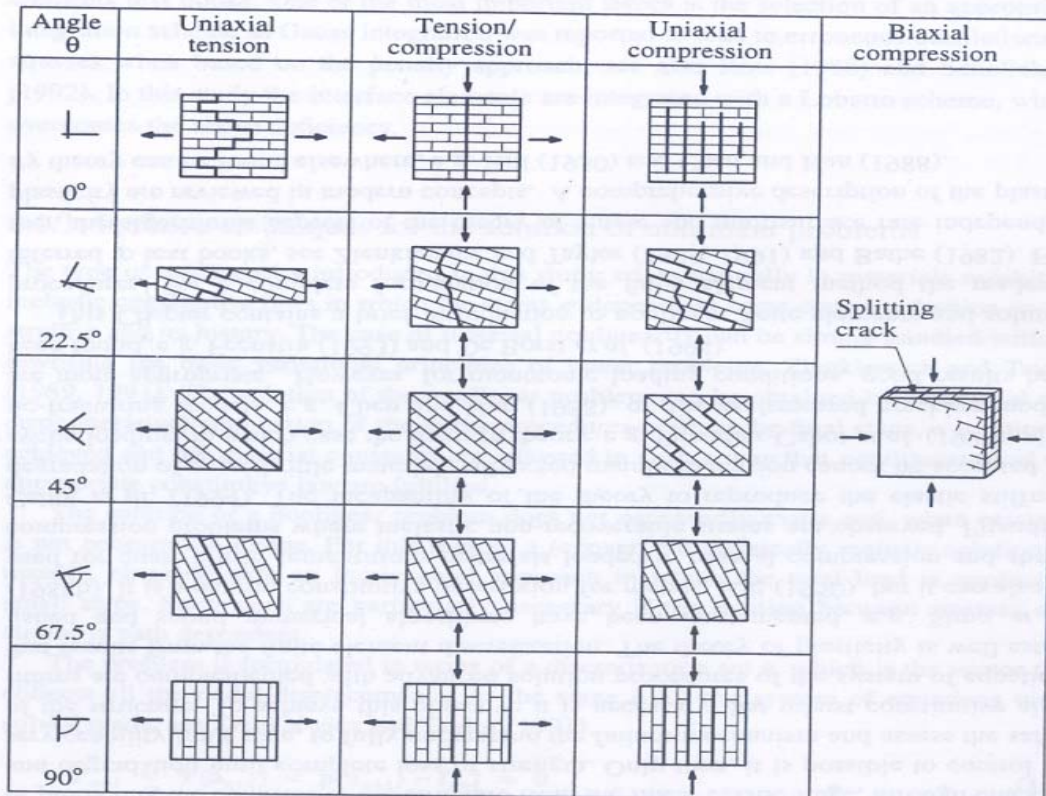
Modes of failure of masonry under biaxial loading (Dhanasekar et al. (1985b))
